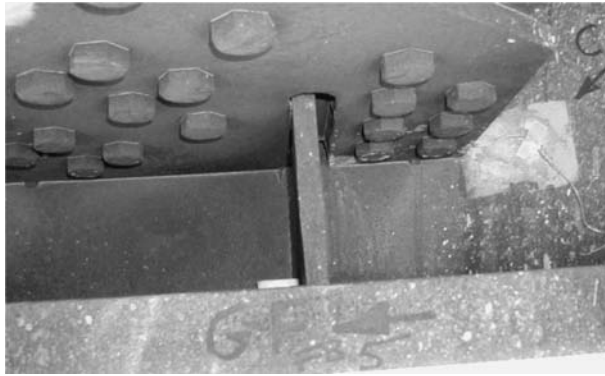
Constraint at the intersection of gusset, transverse stiffener and girder web.
